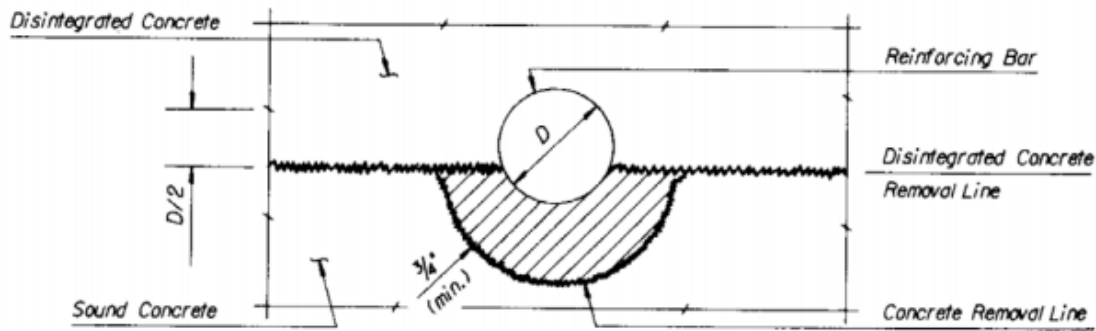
KDOT Plan for Removal of Concrete around Reinforcement with $>1/2$ Bar Exposed
